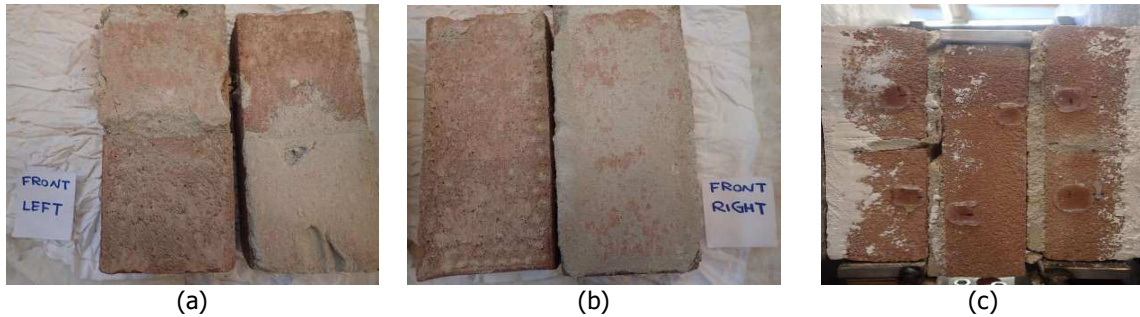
Crack pattern of modified triplet under shear test: (a) front-left joint; (b) front-right joint; (c) front view.
